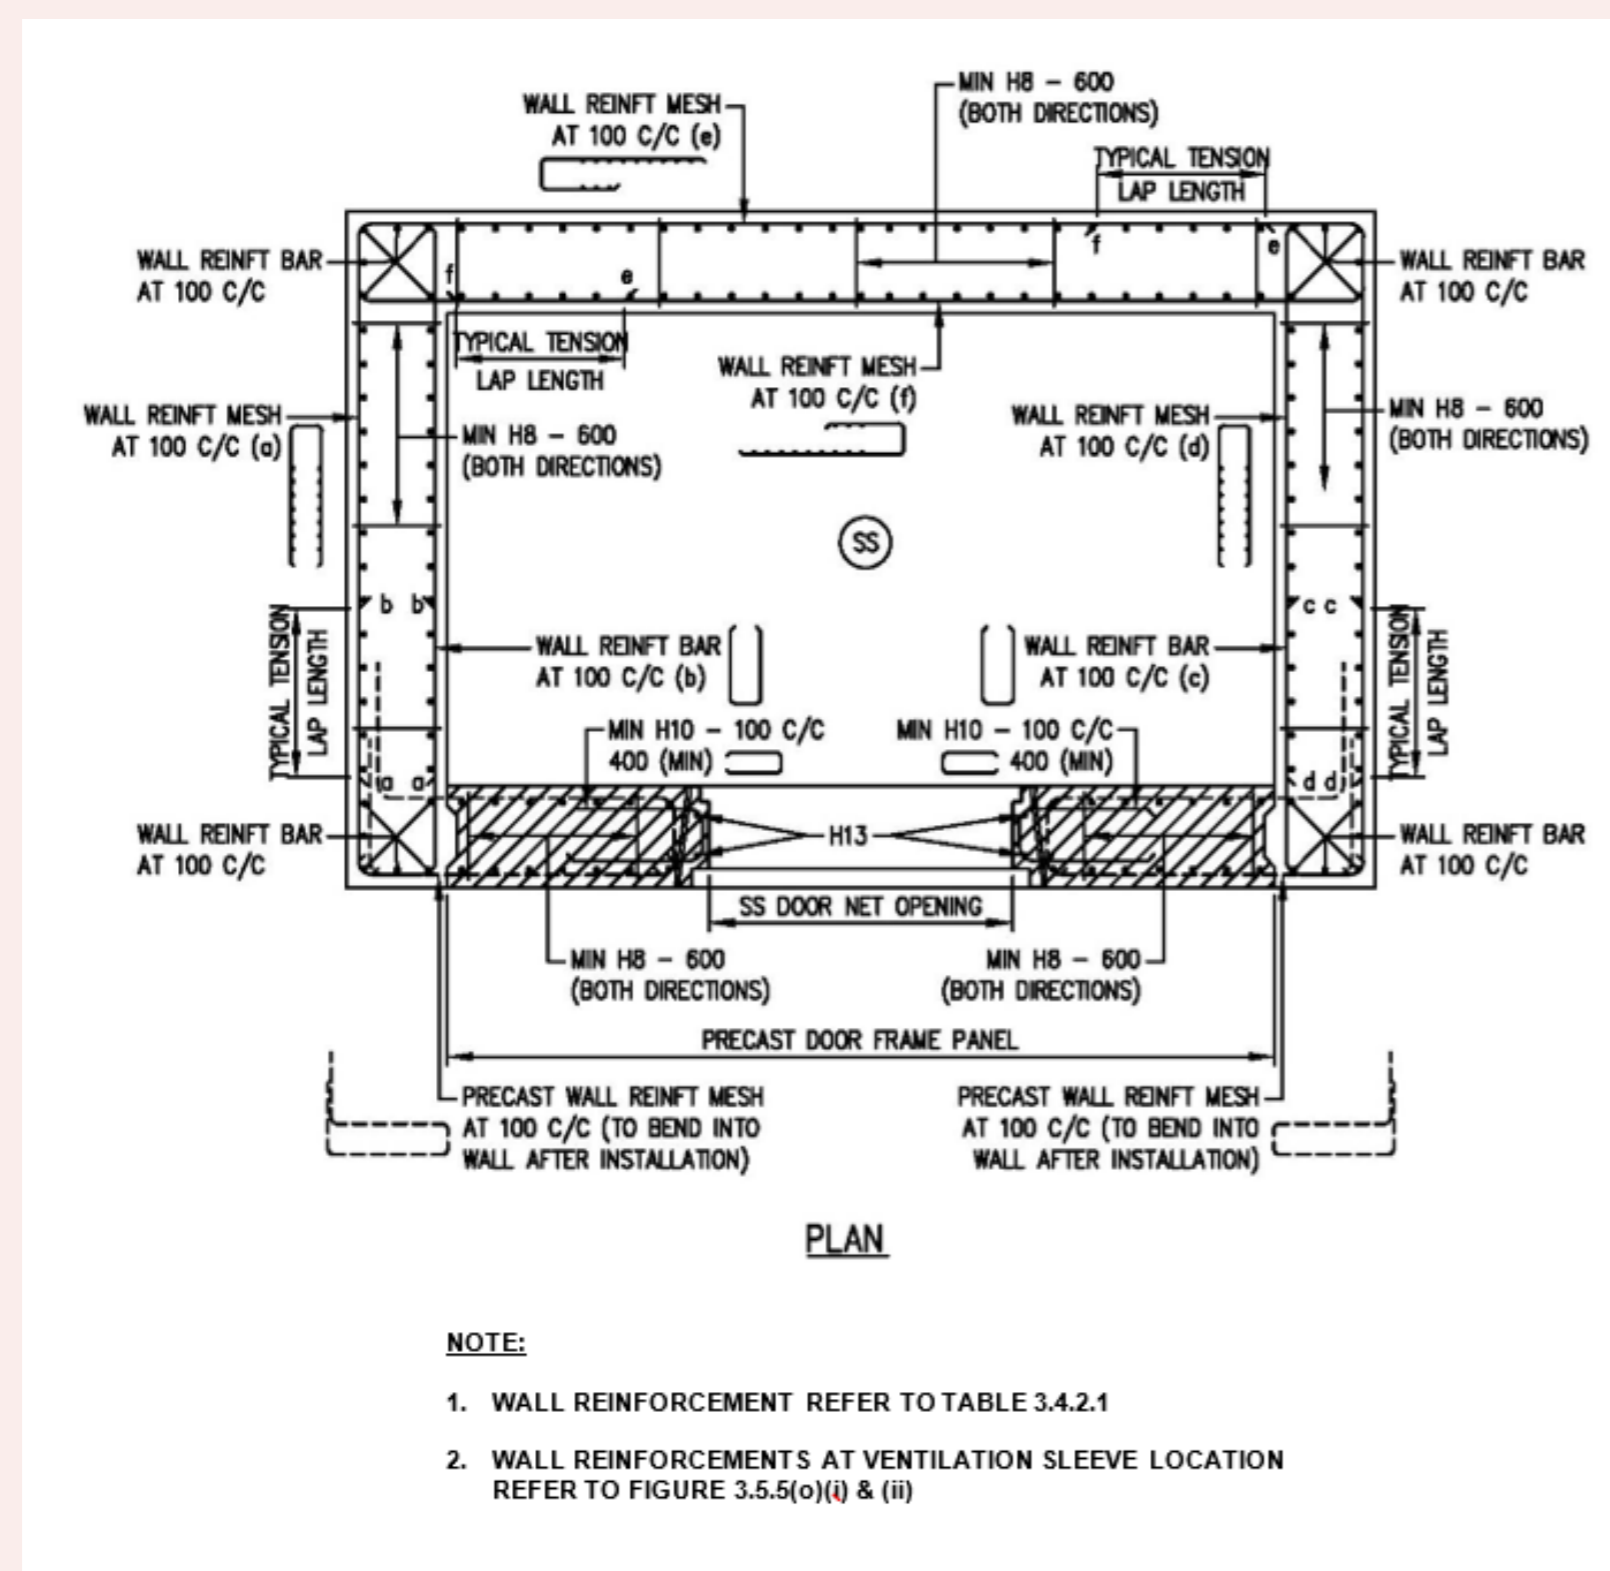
(f): PLAN OF SS WALLS WITH PRECAST SS DOOR FRAME PANEL (TYPE 2)
